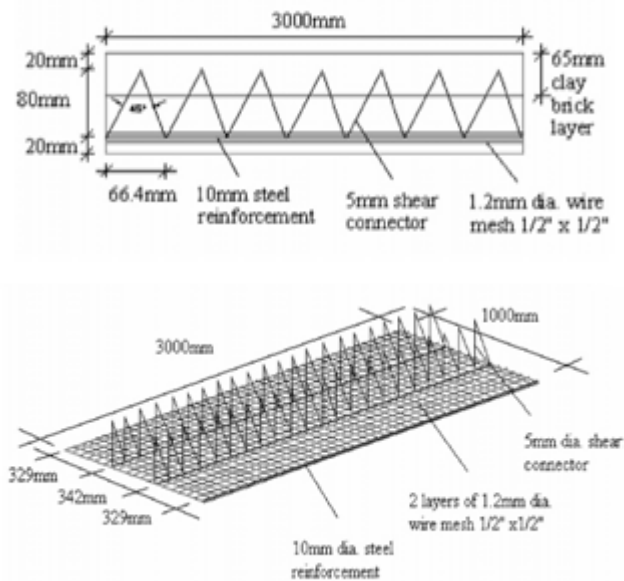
Composite slab details and arrangements of shear trusses and steel reinforcement.
